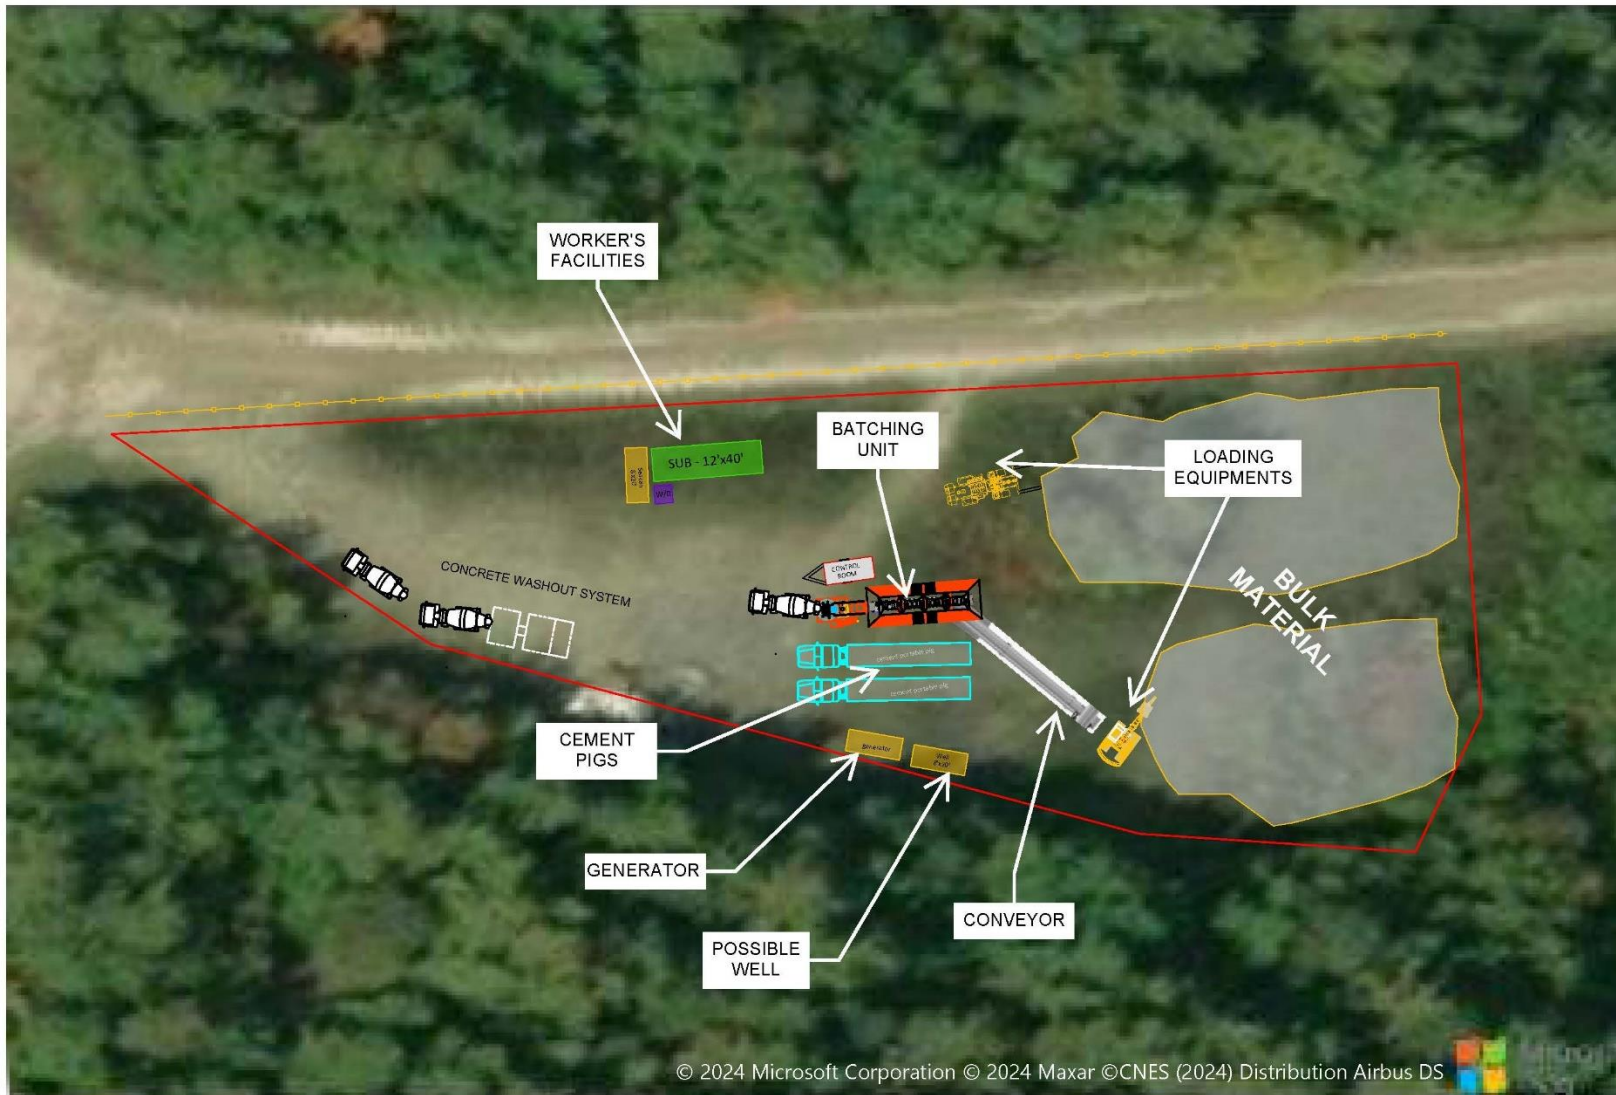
Proposed Mobile Concrete Batch Plant Location
